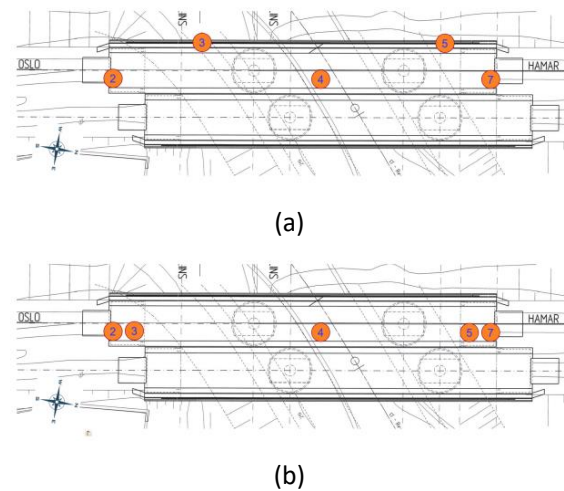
The placement of the accelerometers for (a) layout 1 (b) layout 2
